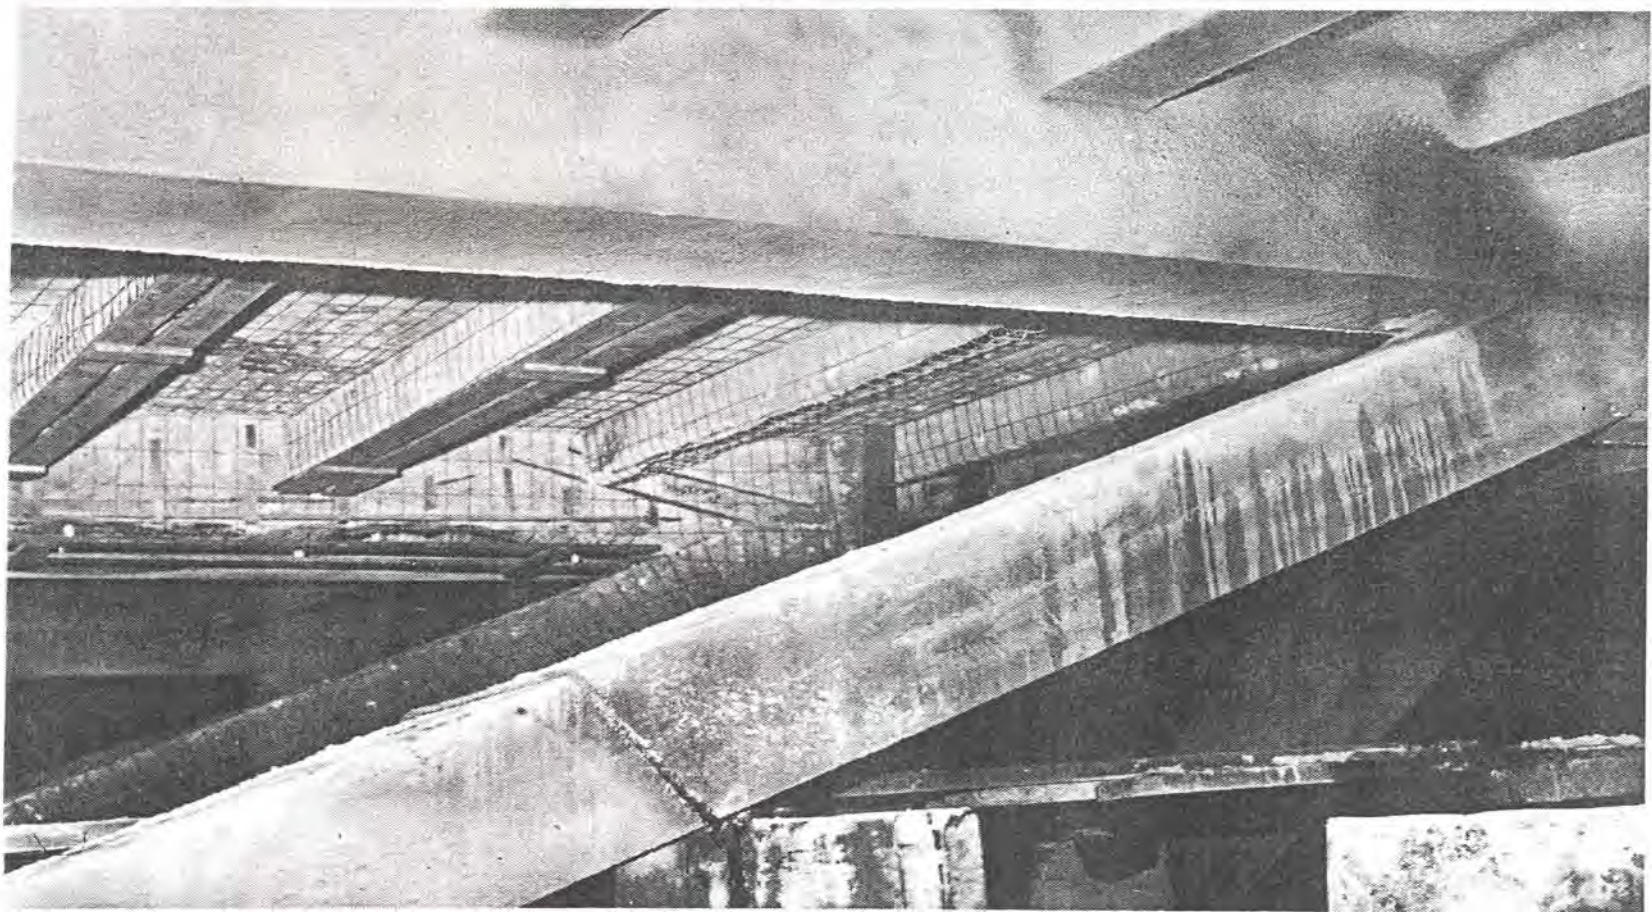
Sprayed concrete repairs to quay substructure in progress and completed
